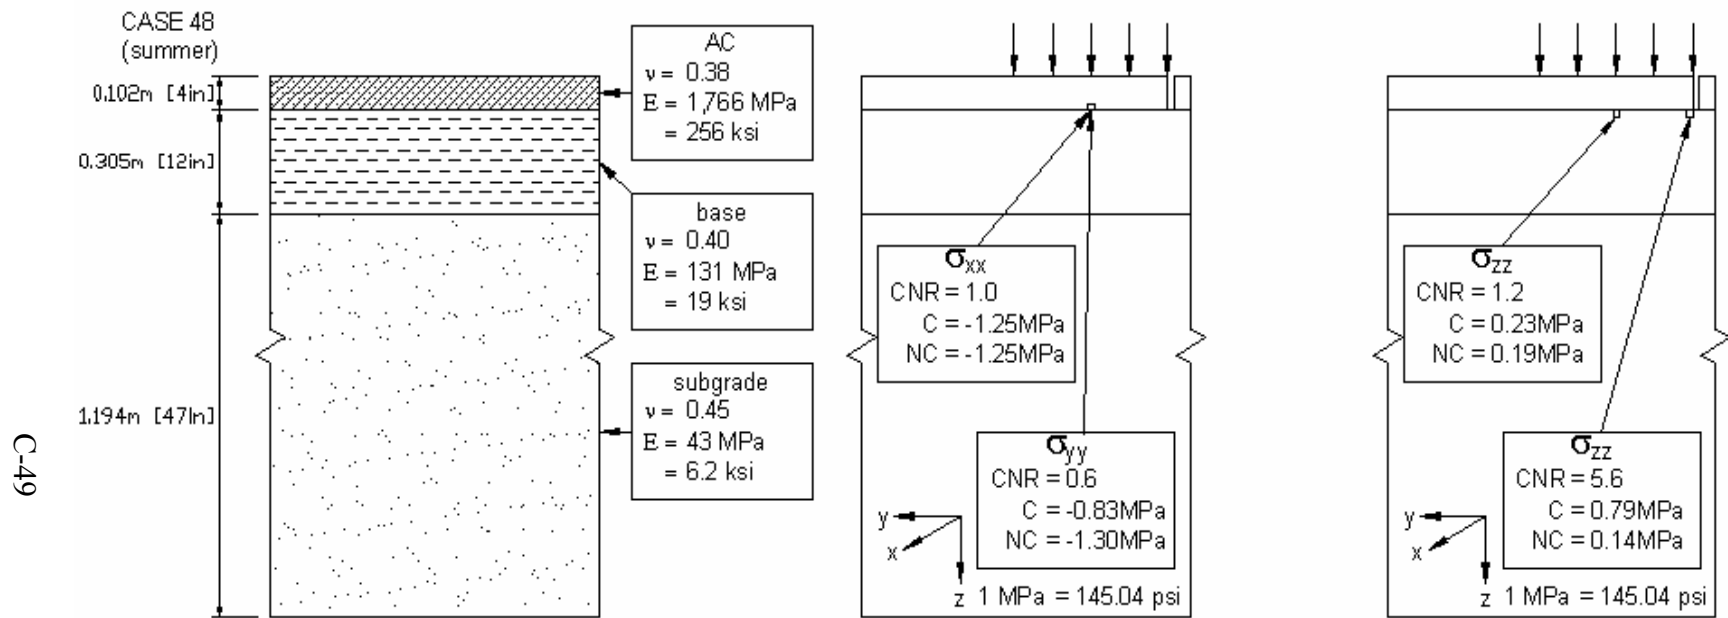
Summary cross section for case 48, (C – stress in cracked pavement, NC – stress in pavement with no crack, CNR – crack/no crack (stress) ratio)
